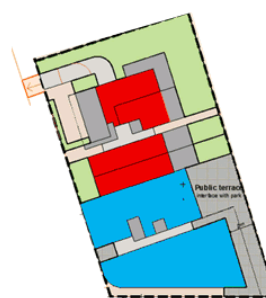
PROPOSED BUILT FORM PLAN
